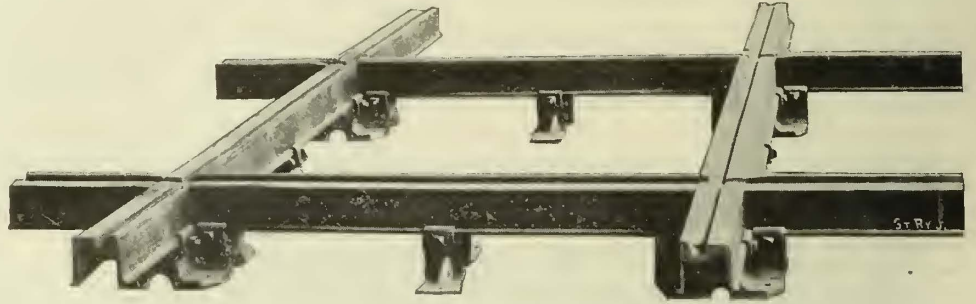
LEWIS & FOWLER GIRDER RAIL CROSSING.
